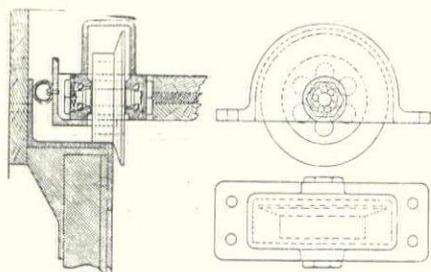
DETAIL OF SLIDING SHUTTER.
